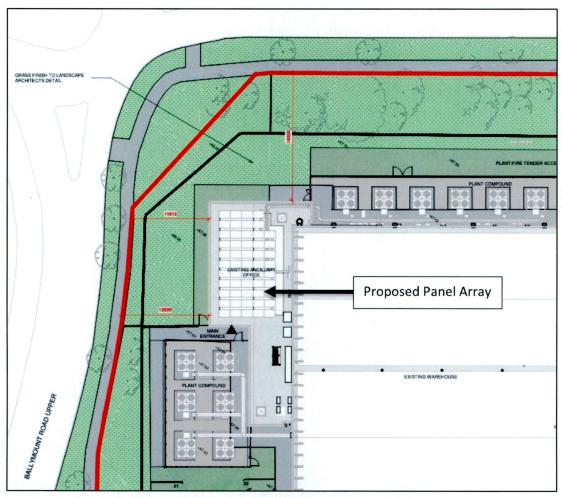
Extract from the Proposed Roof Plan, indicating the location of the proposed PV panels.
